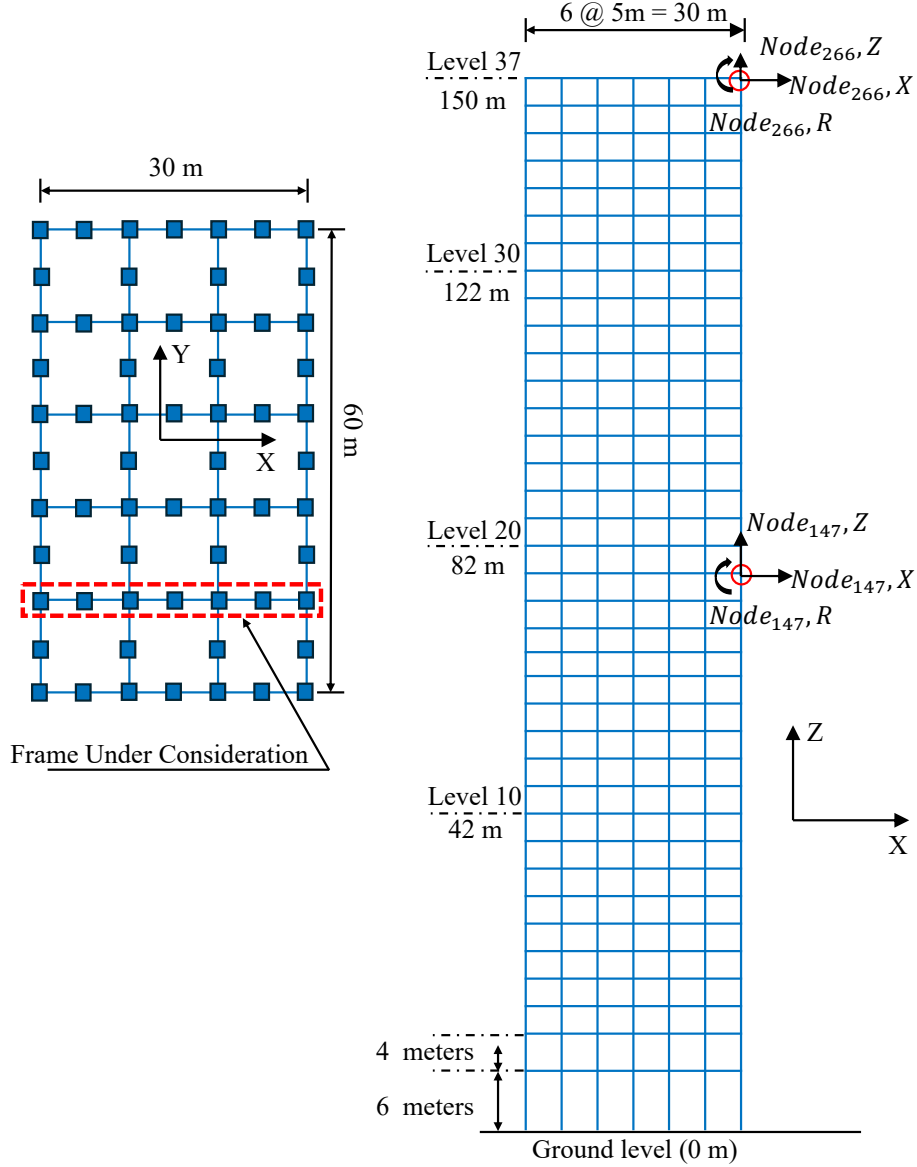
Layout of the 2D 37-story six-bay steel frame building.
